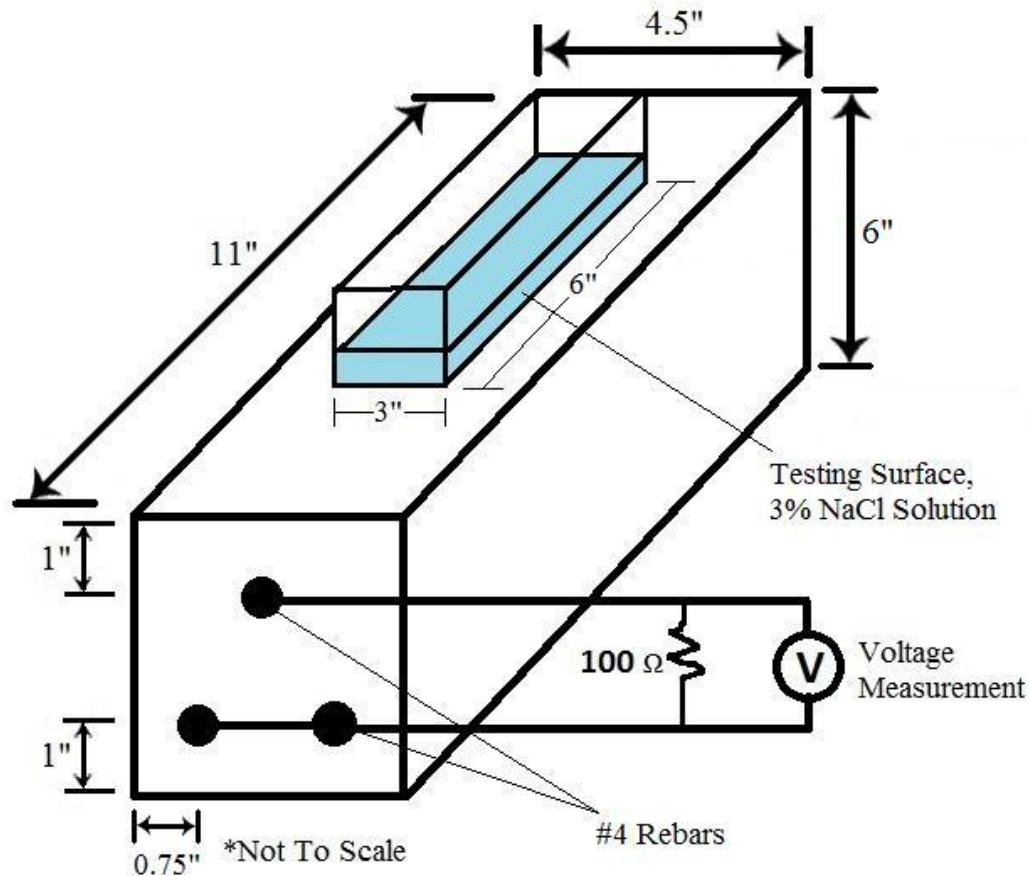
Schematic of testing setup for reinforced concrete block
